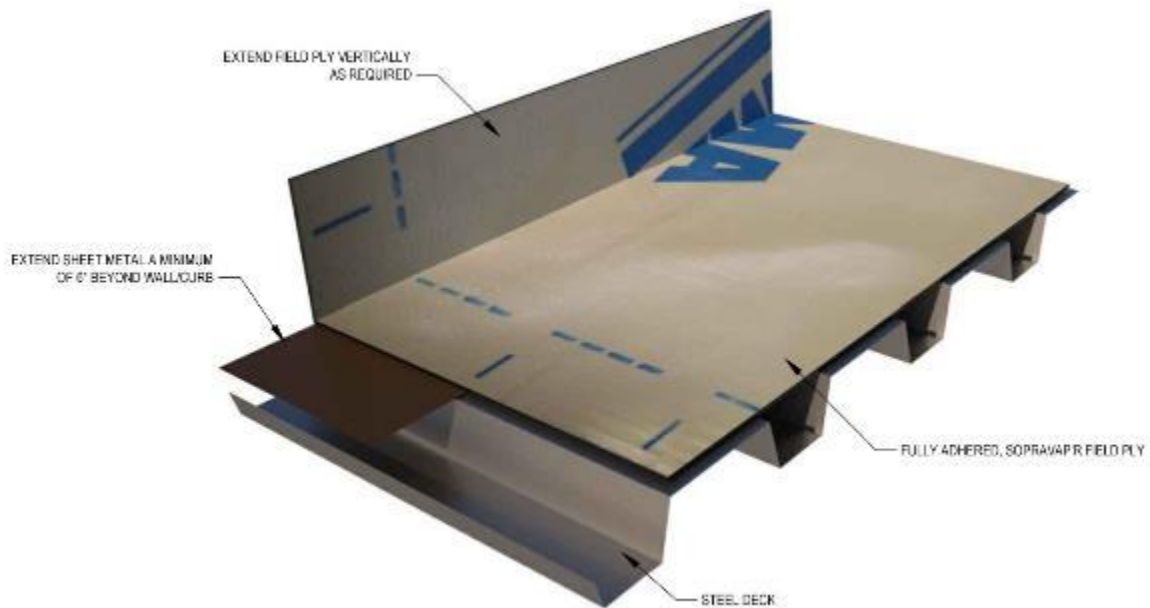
Fully Adhered, Self-Adhesive SOPRAVAP'R Termination at Wall/Curb On Steel Deck
